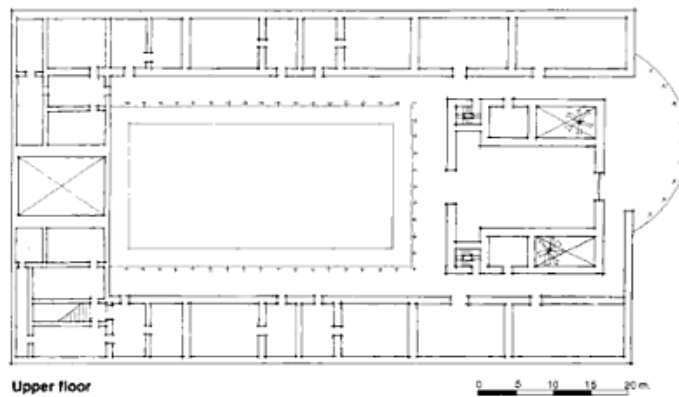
Reconstructed plan of the Promontory Palace, upper floor
